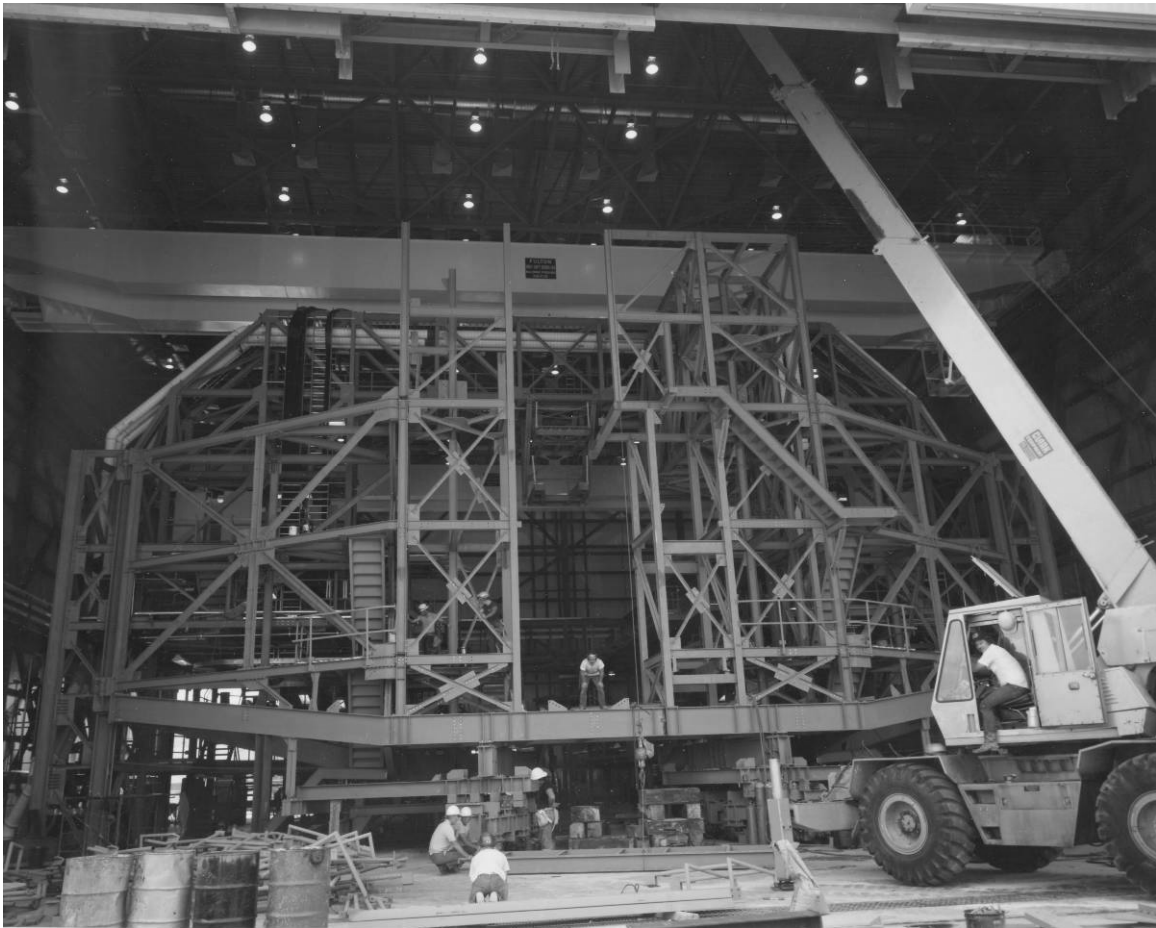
View of OPF High Bay No. 1, 513 workstand installation, August 23, 1977.
